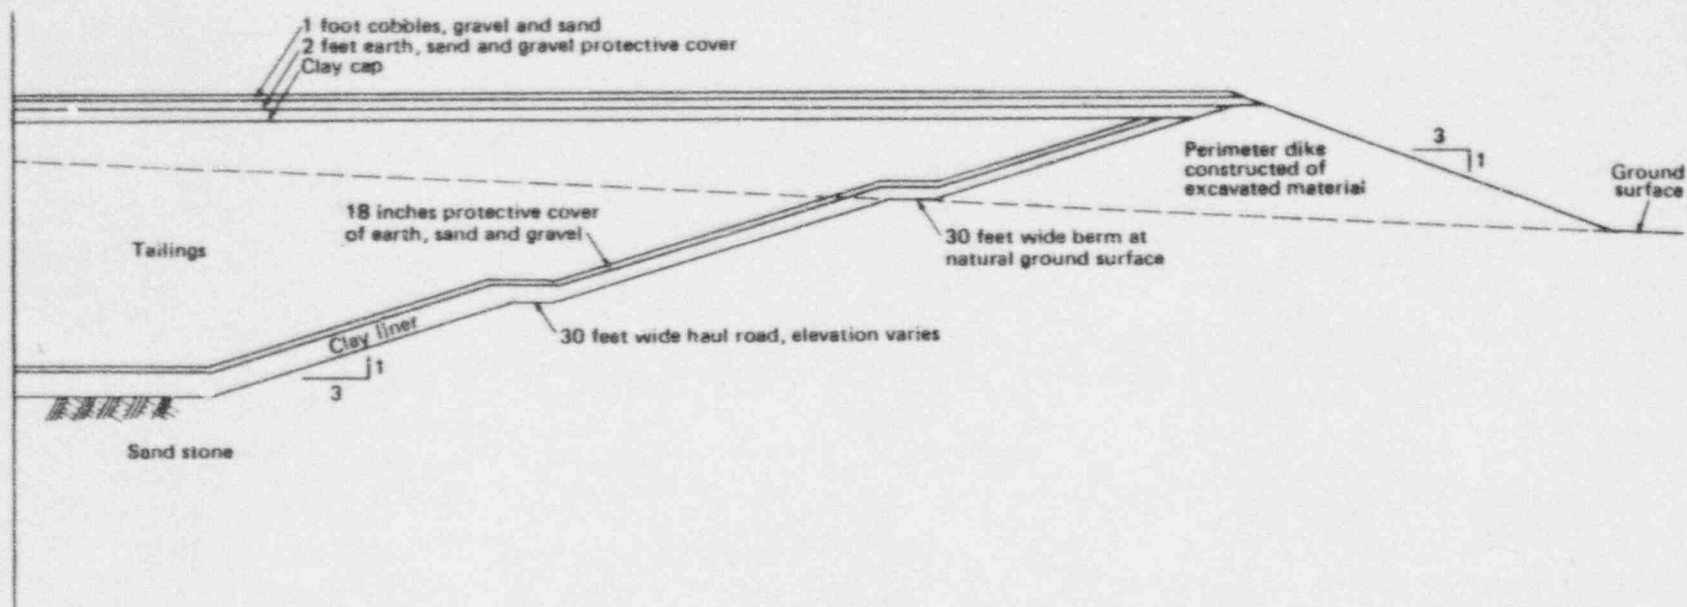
Shootering Canyon uranium project tailings disposal study: Tailings containment structure—combined excavated pit and dike
